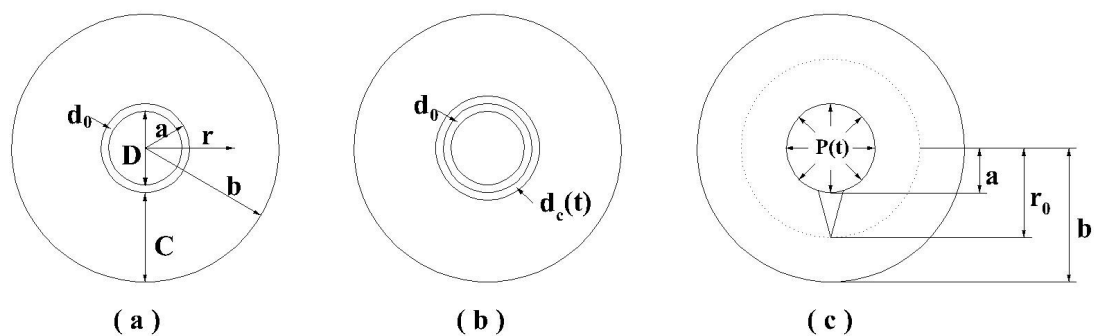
Illustration of internal pressure induced concrete cracking process
